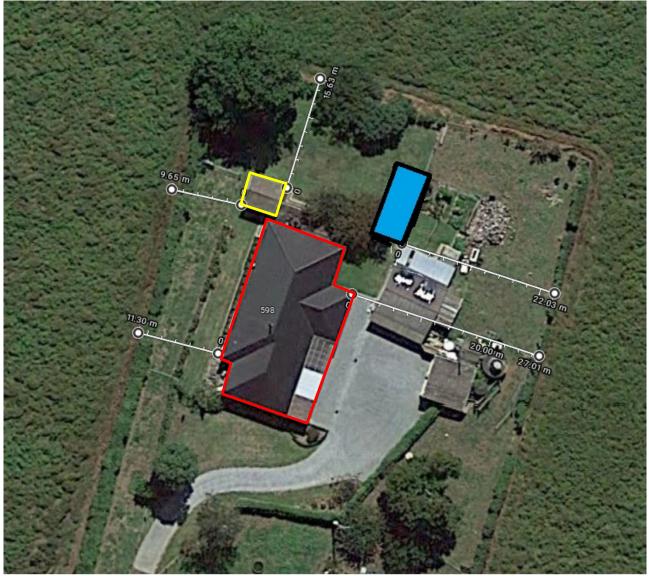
Dwelling (Outlined in Red) based on Definitions from the District Plan.
